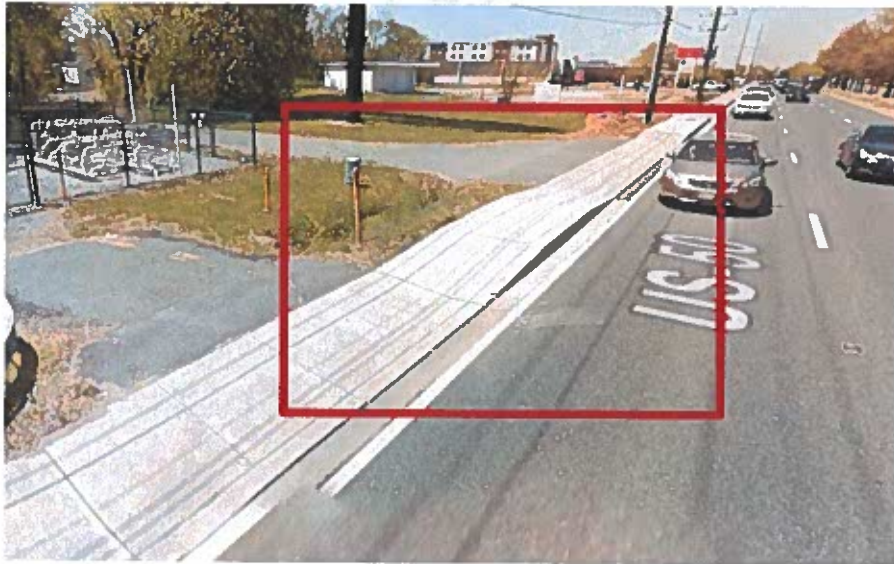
Existing sidewalk along Route 50 sloping down at driveway entrances
